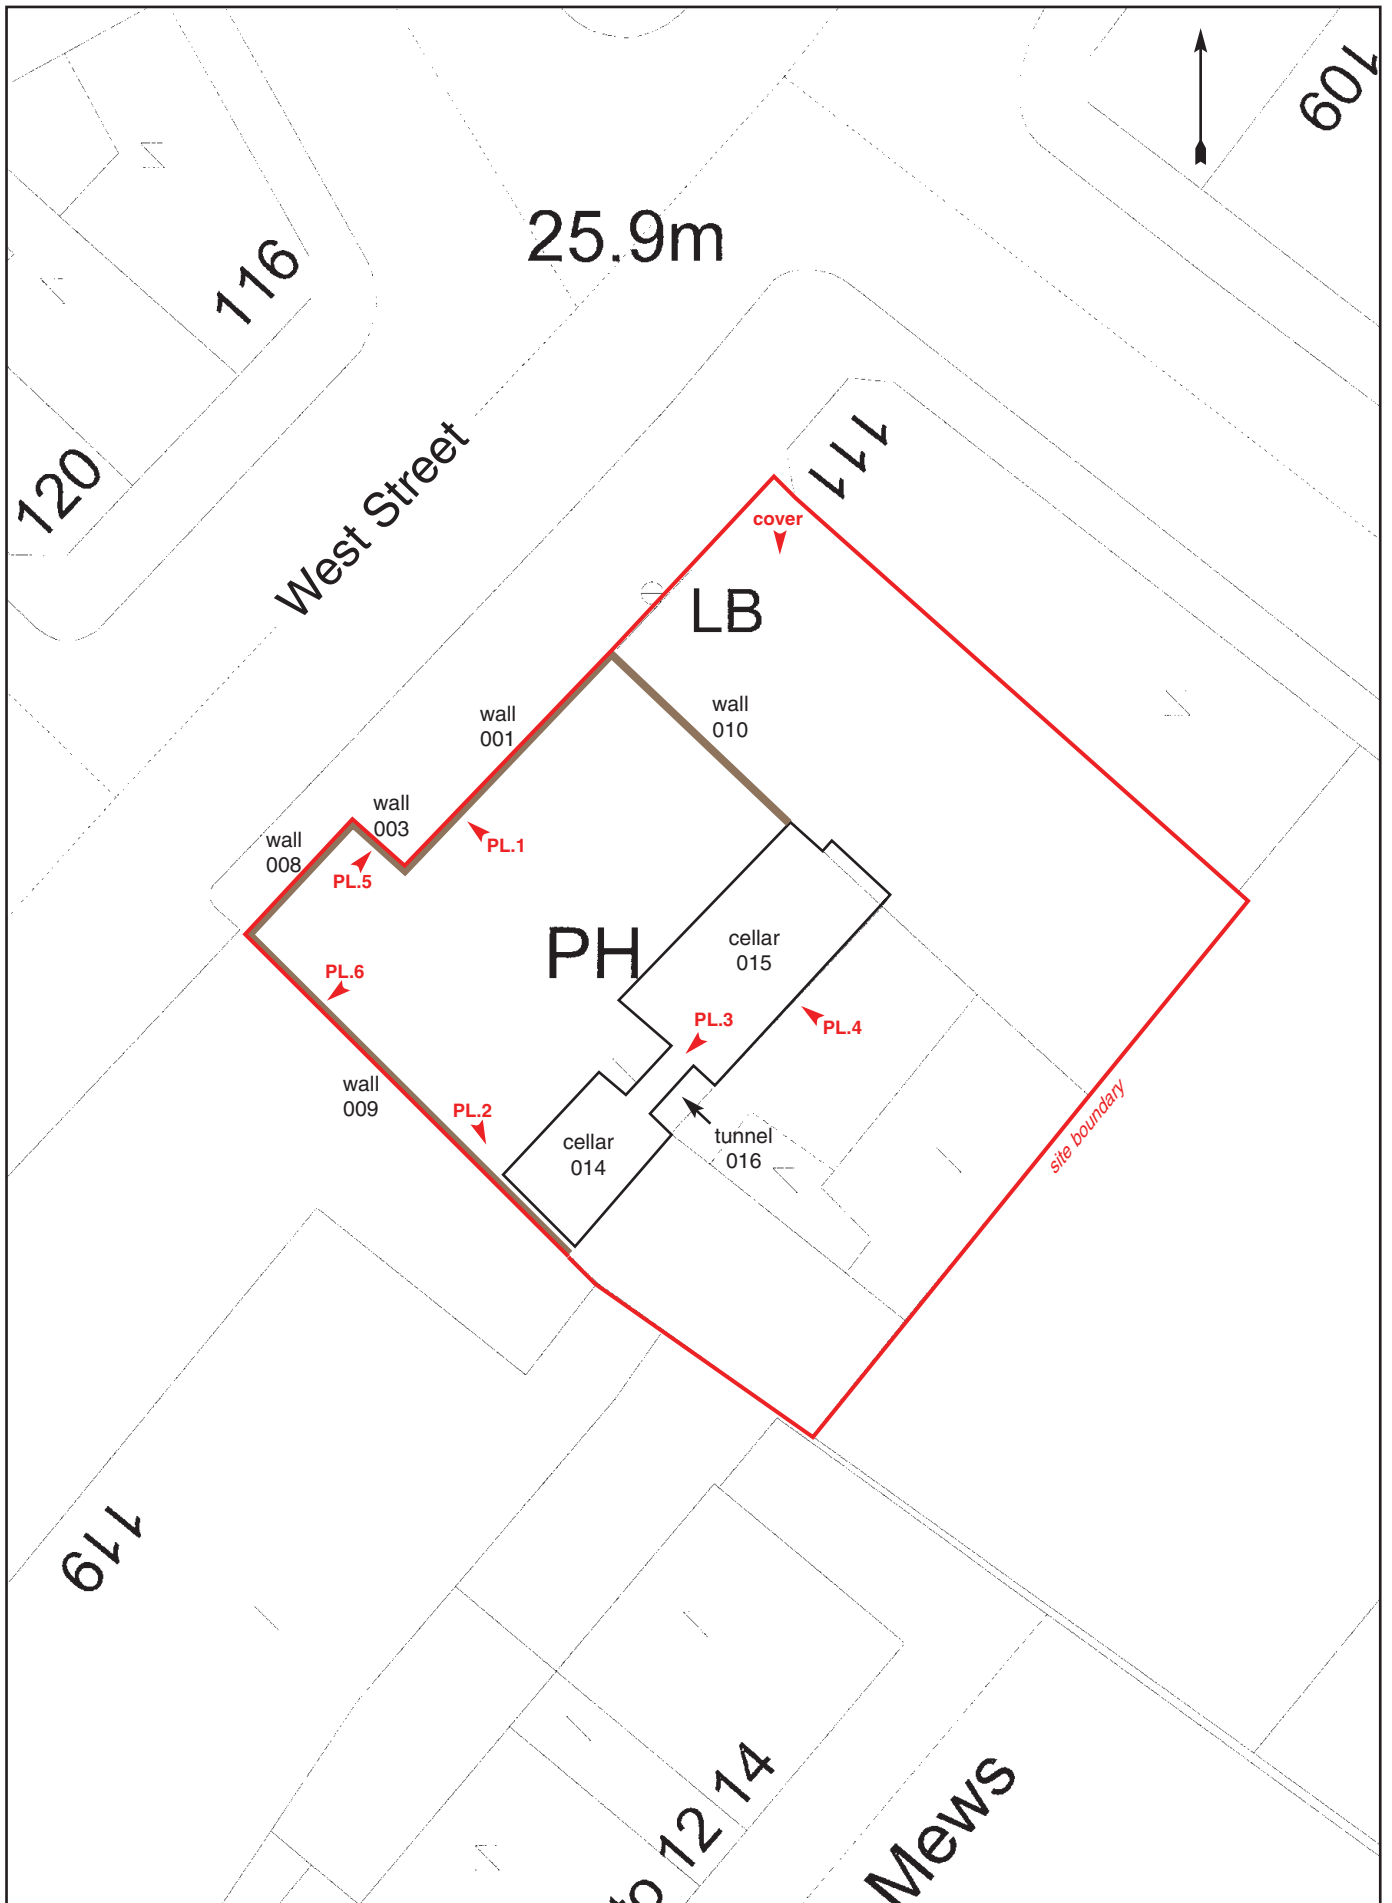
Plan showing study area in detail, scale 1:250, showing plate orientations in red
